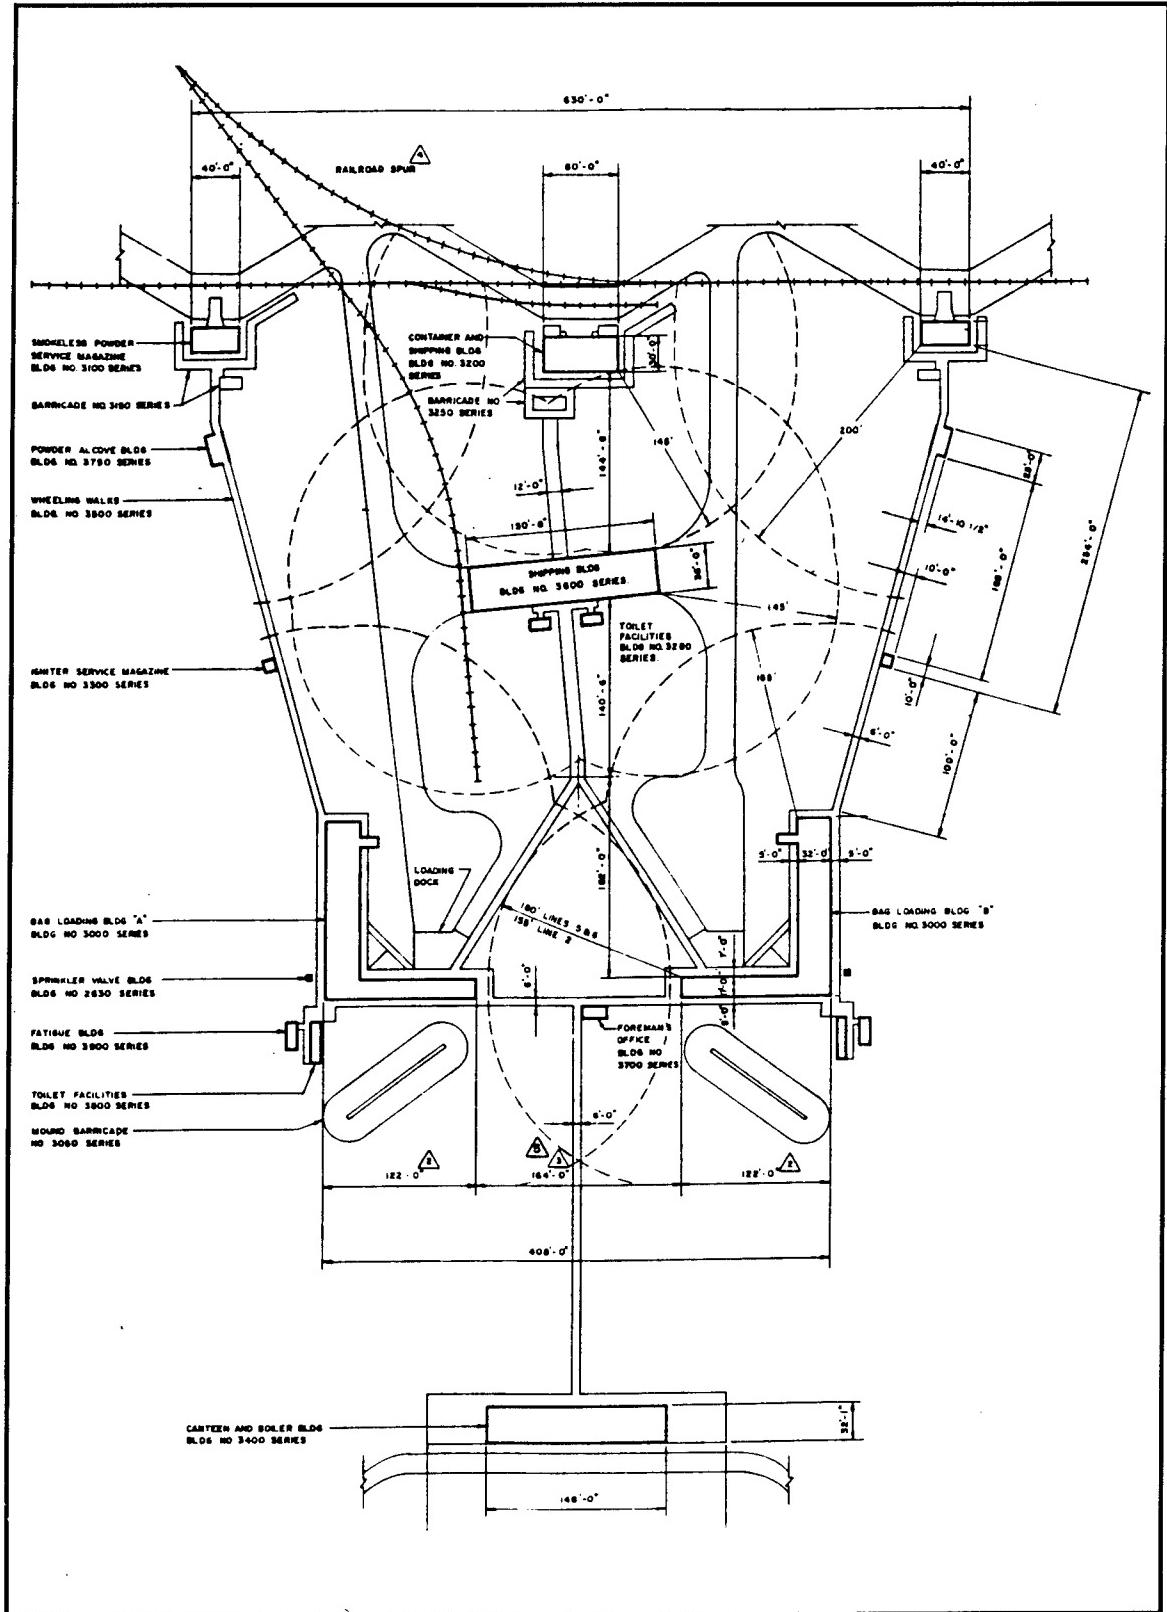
Safety quantity distances for buildings in a typical LAP building group at Hoosier Ordnance Plant (INAAP Drawing 400-900-146).
